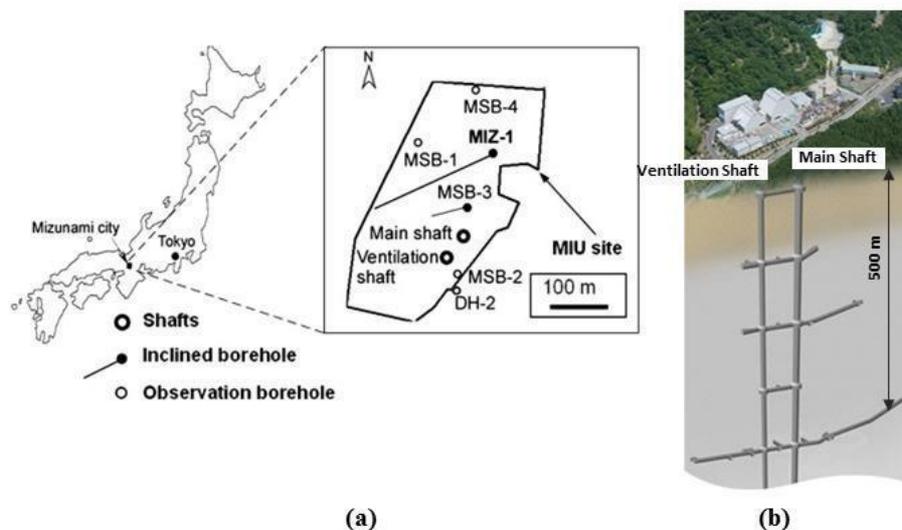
a) Location of the MIU site and the selected boreholes in and around the MIU construction site. b) Two Shafts excavation
